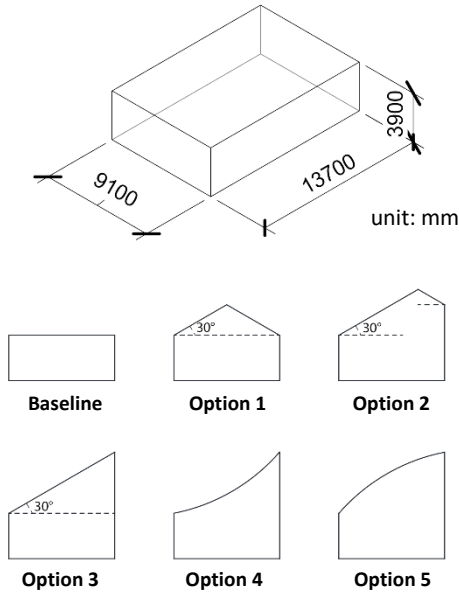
Tested building dimension (top) and the cross sections of the tested roof design parameters (bottom).
